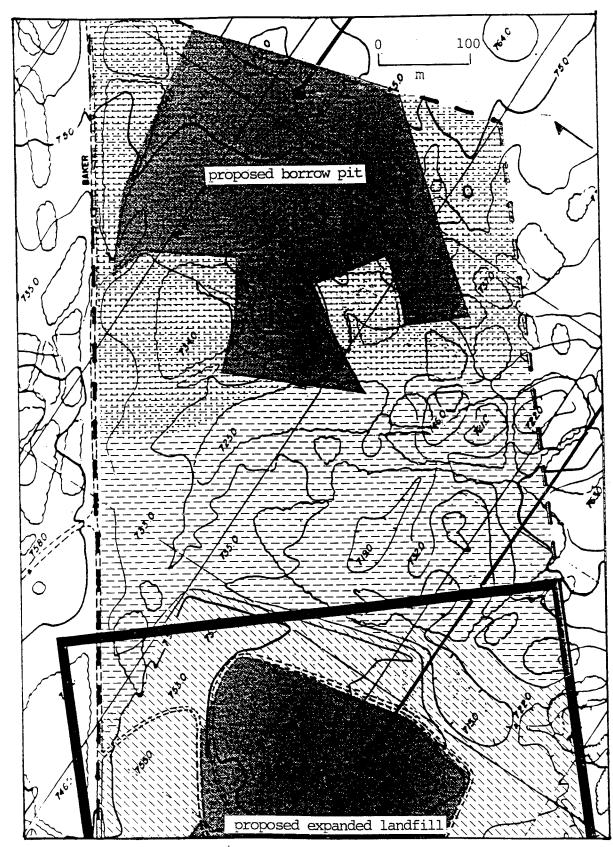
Plan View of Northeast Half of Landfill and Borrow Tract.
